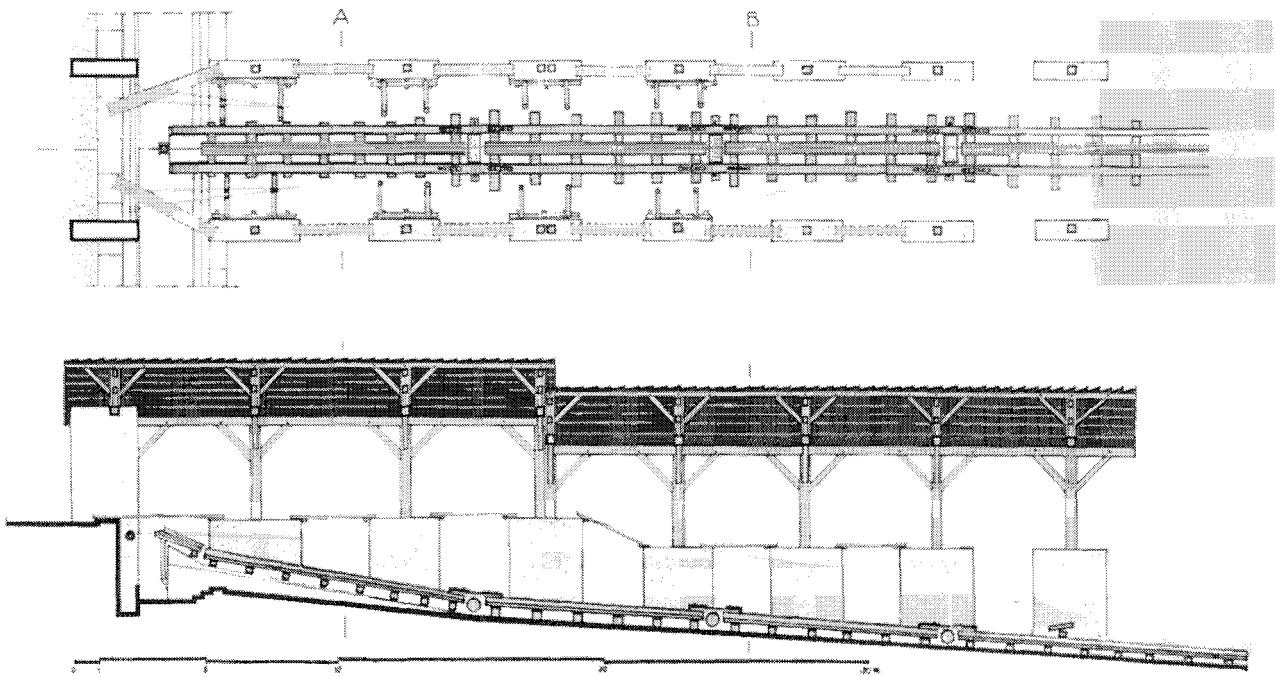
Kition: plan and reconstructed longitudinal section of a shipshed (courtesy: M. Yon)
